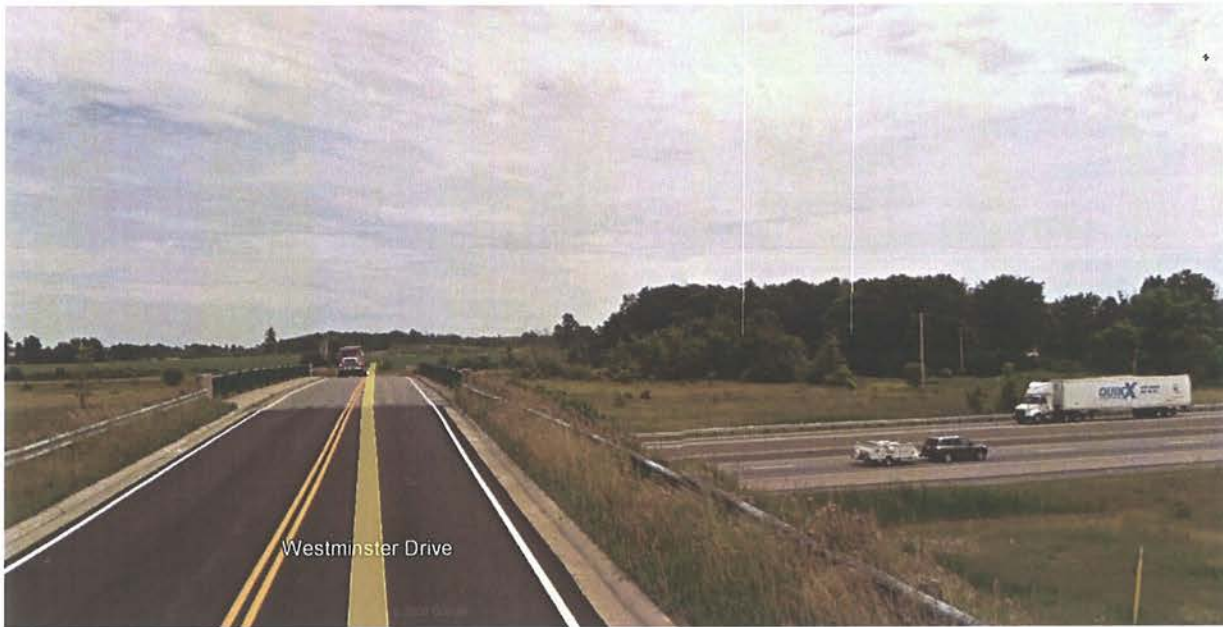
Westminster Drive looking south at Highway 401 (Google Earth Pro® Image).
